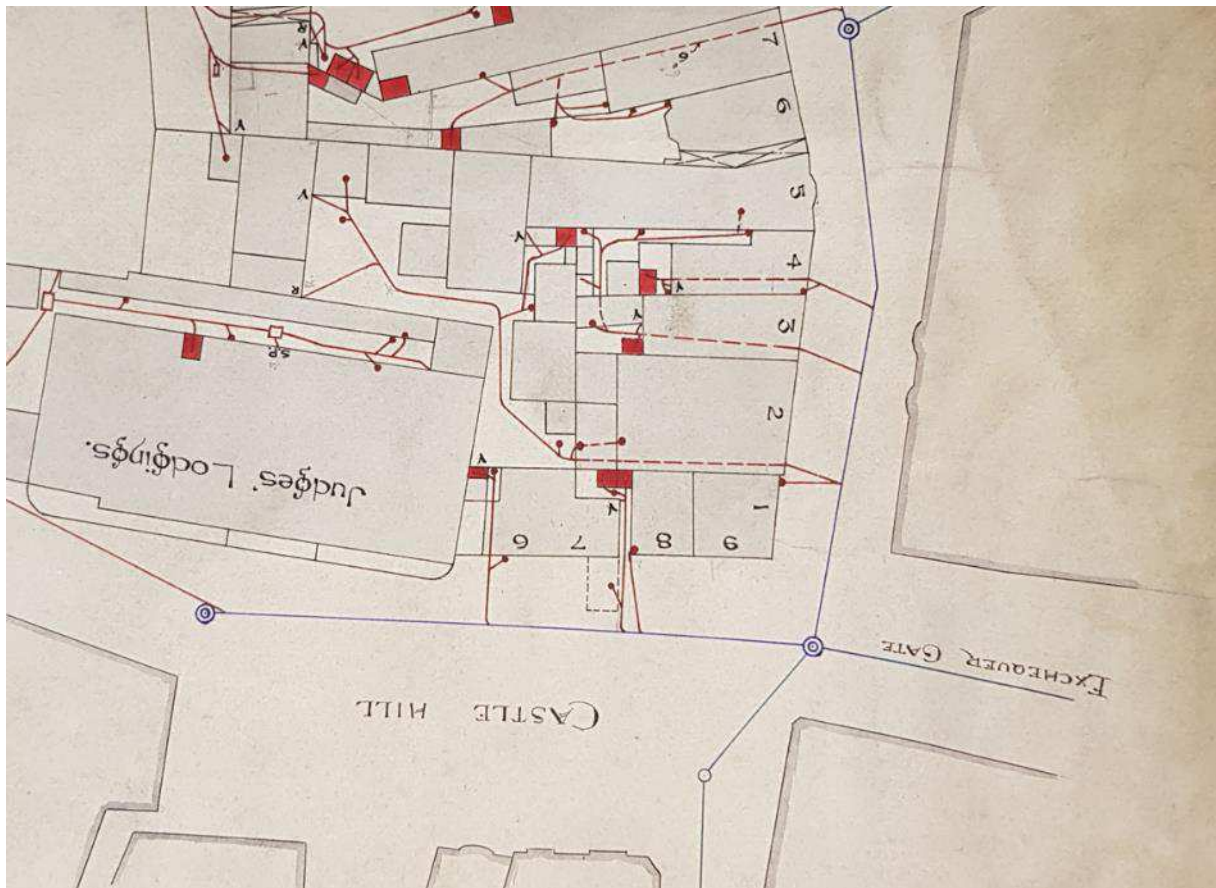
Extract from the 1909 Lincoln Corporation House Connections (sewerage) plan showing the study area as 8 and 9 Castle Hill and 1 Bailgate.³⁸
